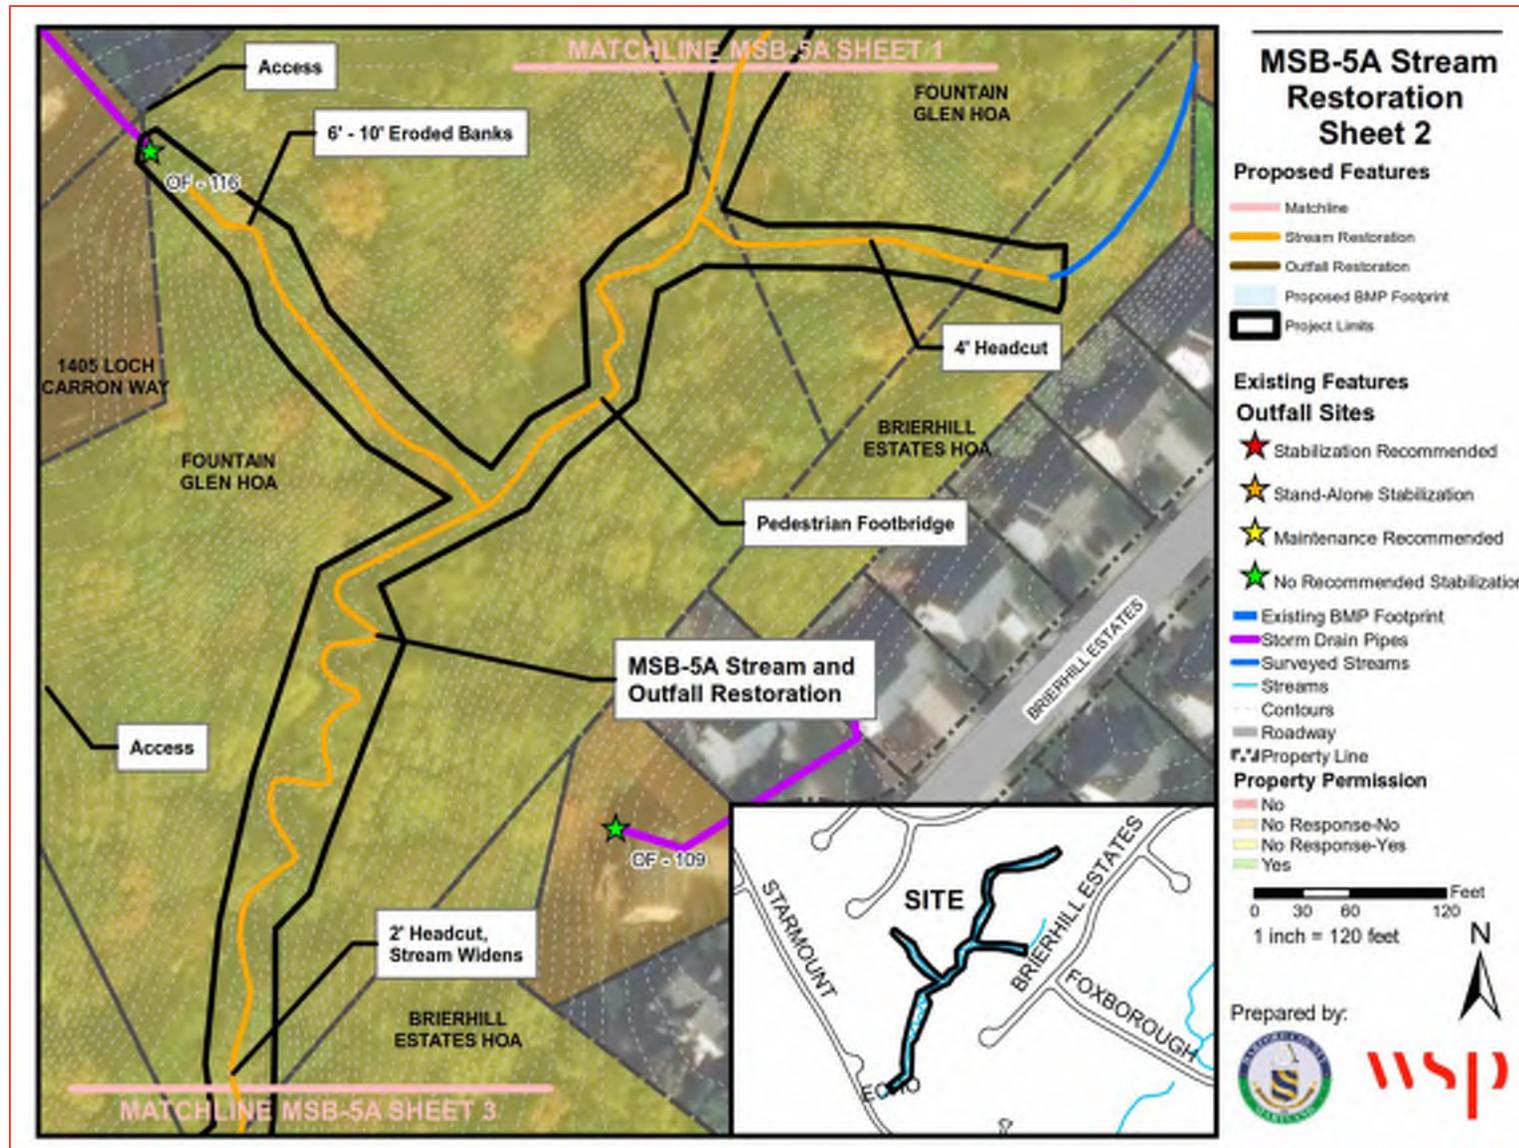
Site Location and Proposed Project Plan for MSB-5A Stream and Outfall Restoration (Sheet 2 of 3)
